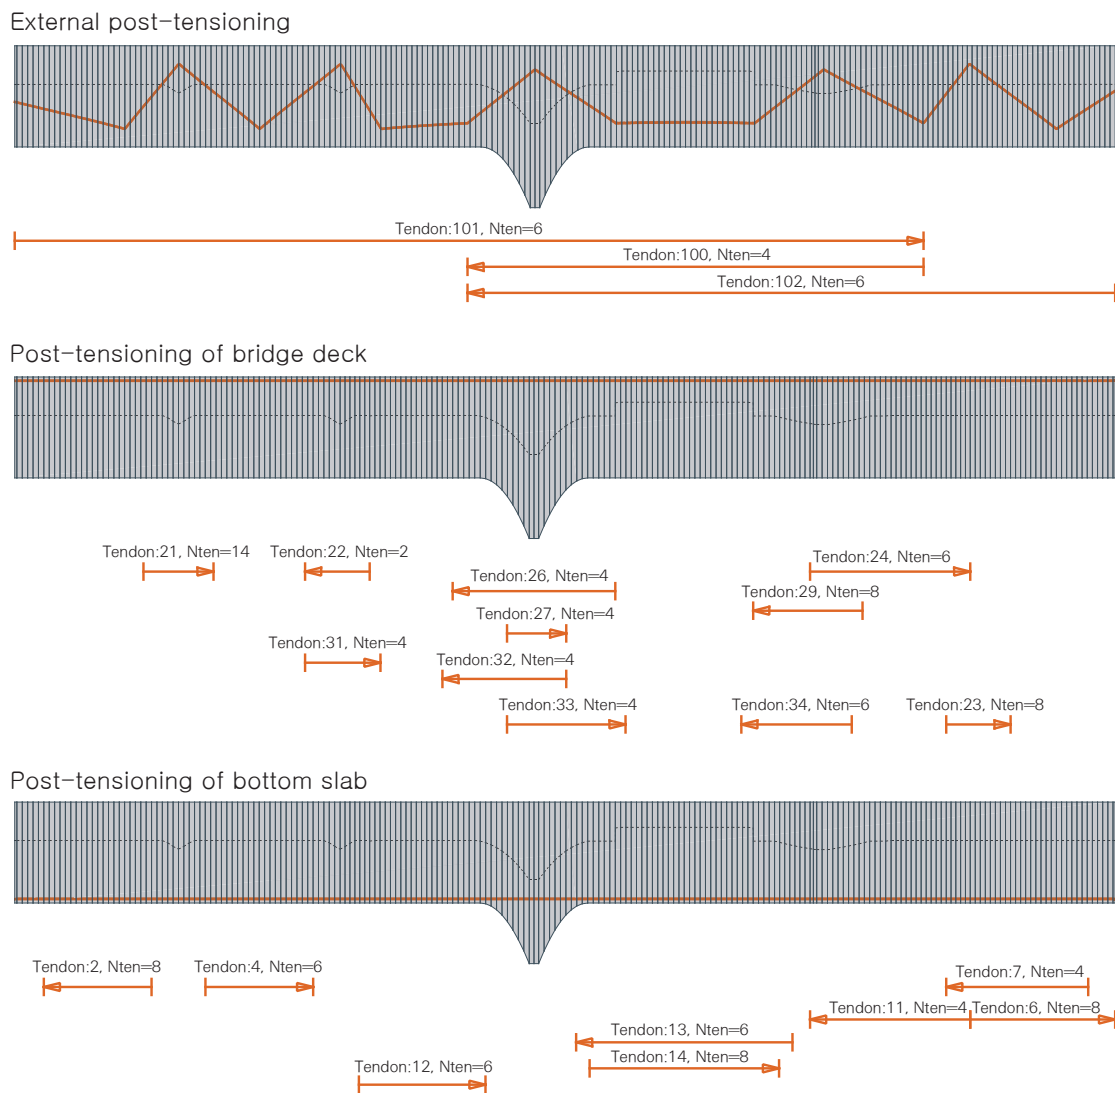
External and internal post-tensioning of the newly designed bypass bridges (FCP, 2014)
